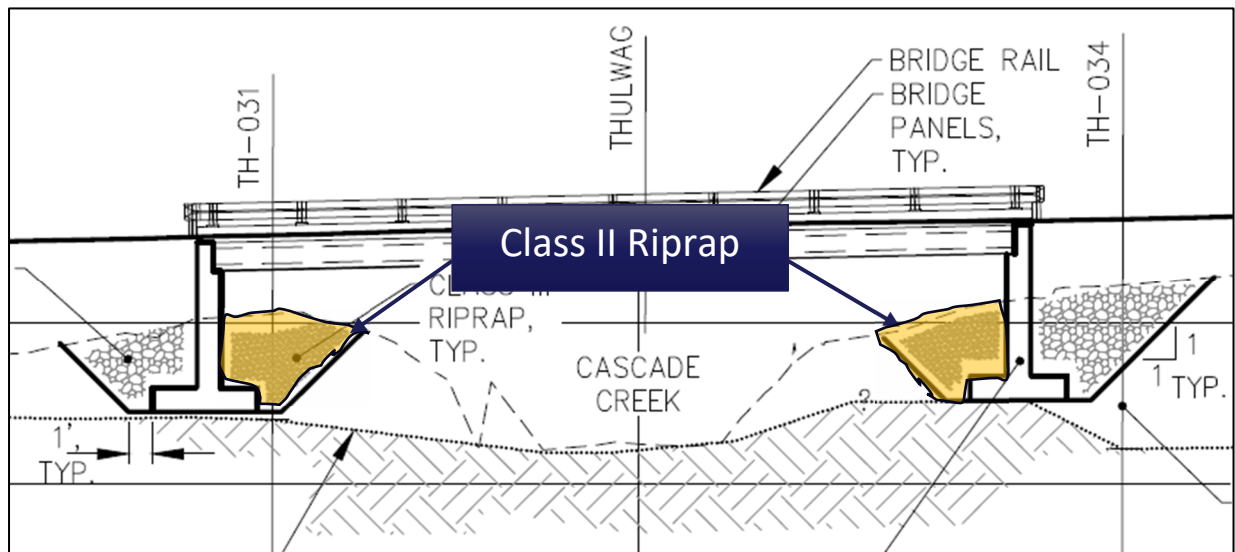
Profile view of recommended scour protection along the bridge abutments.
